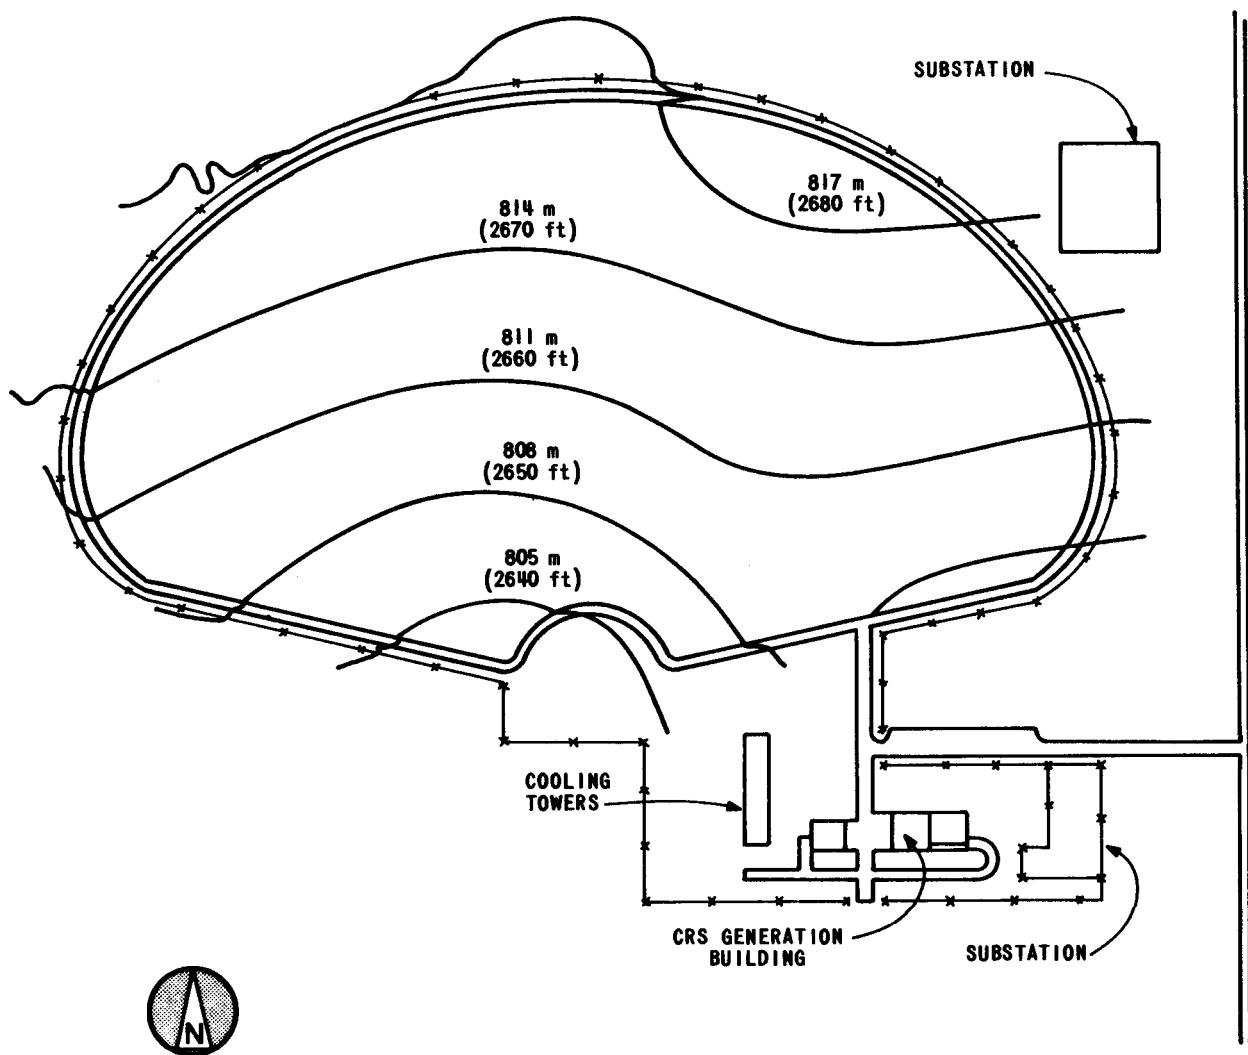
I-3 COLLECTOR FIELD SITE GRADING PLAN
